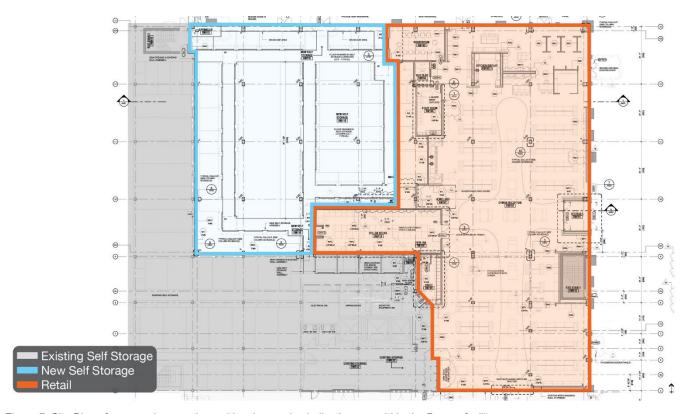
Site Plan of proposed renovations with color overlay indicating use within the Dymon facility.
